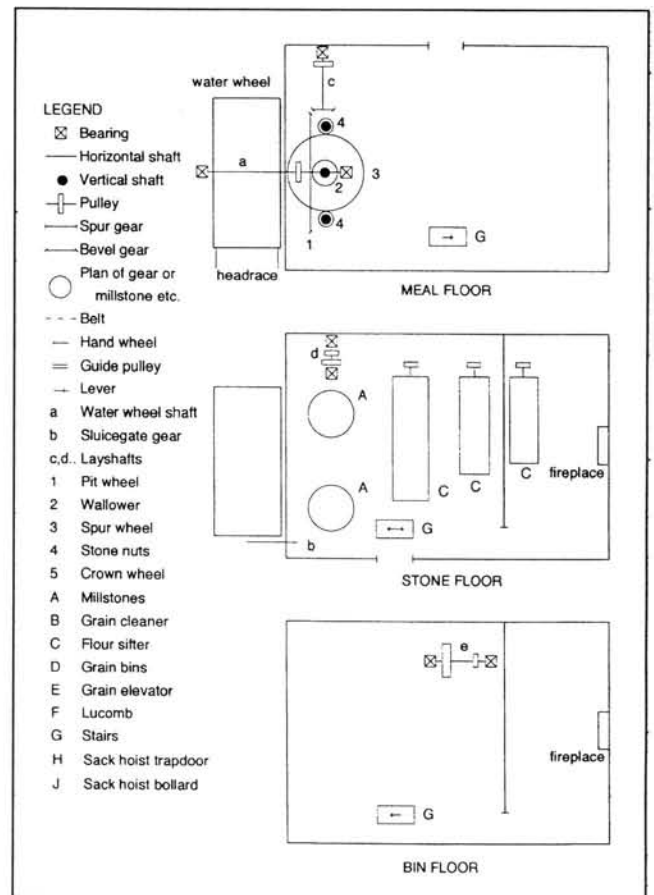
Diagram of machinery layout, Millbrook Mill.
